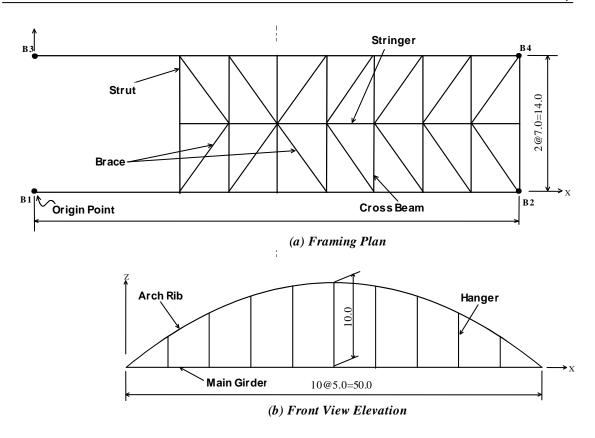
Framing Plan and Front View Elevation of the Arch Bridge [Unit: m]
